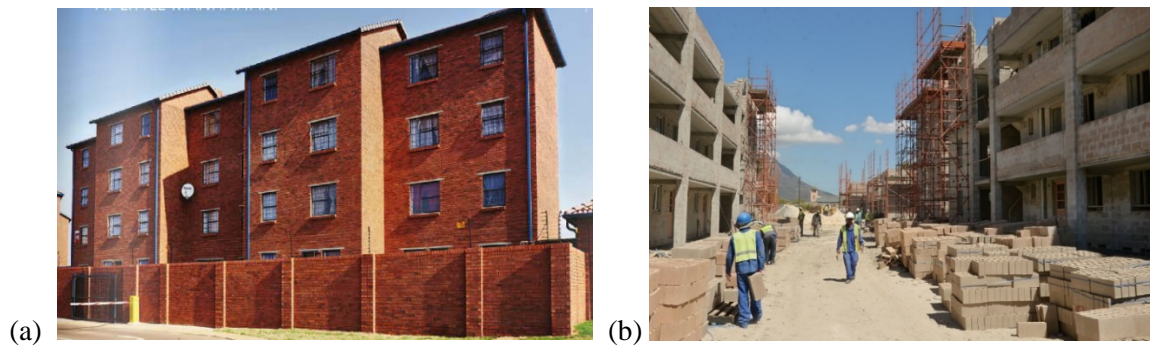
Typical unreinforced load bearing (a) clay brick and (b) concrete block masonry residential buildings in the Western Cape, South Africa.
